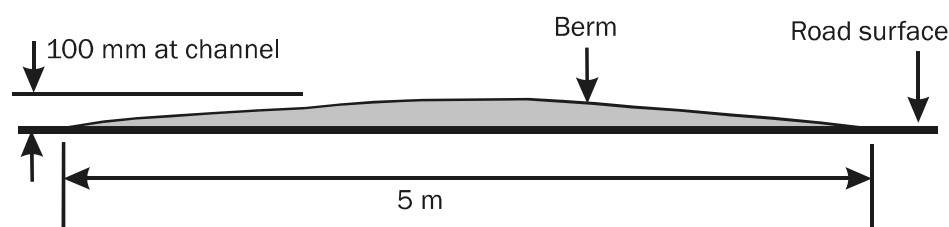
Example berm profile (adapted from Walesh et al, 1999)
